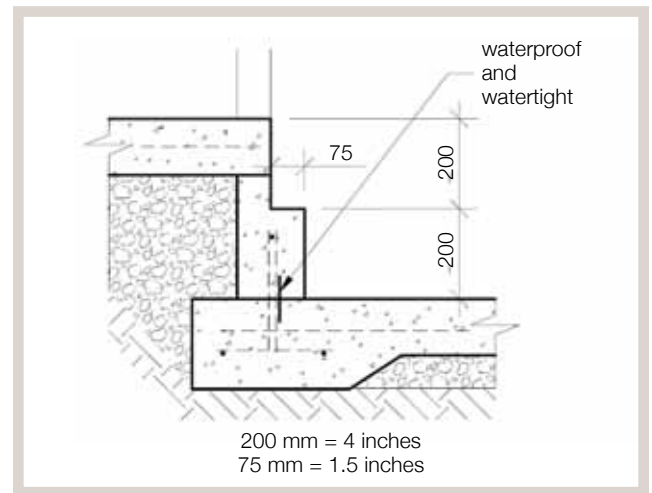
Foundation designed to be watertight (dimensions metric).
